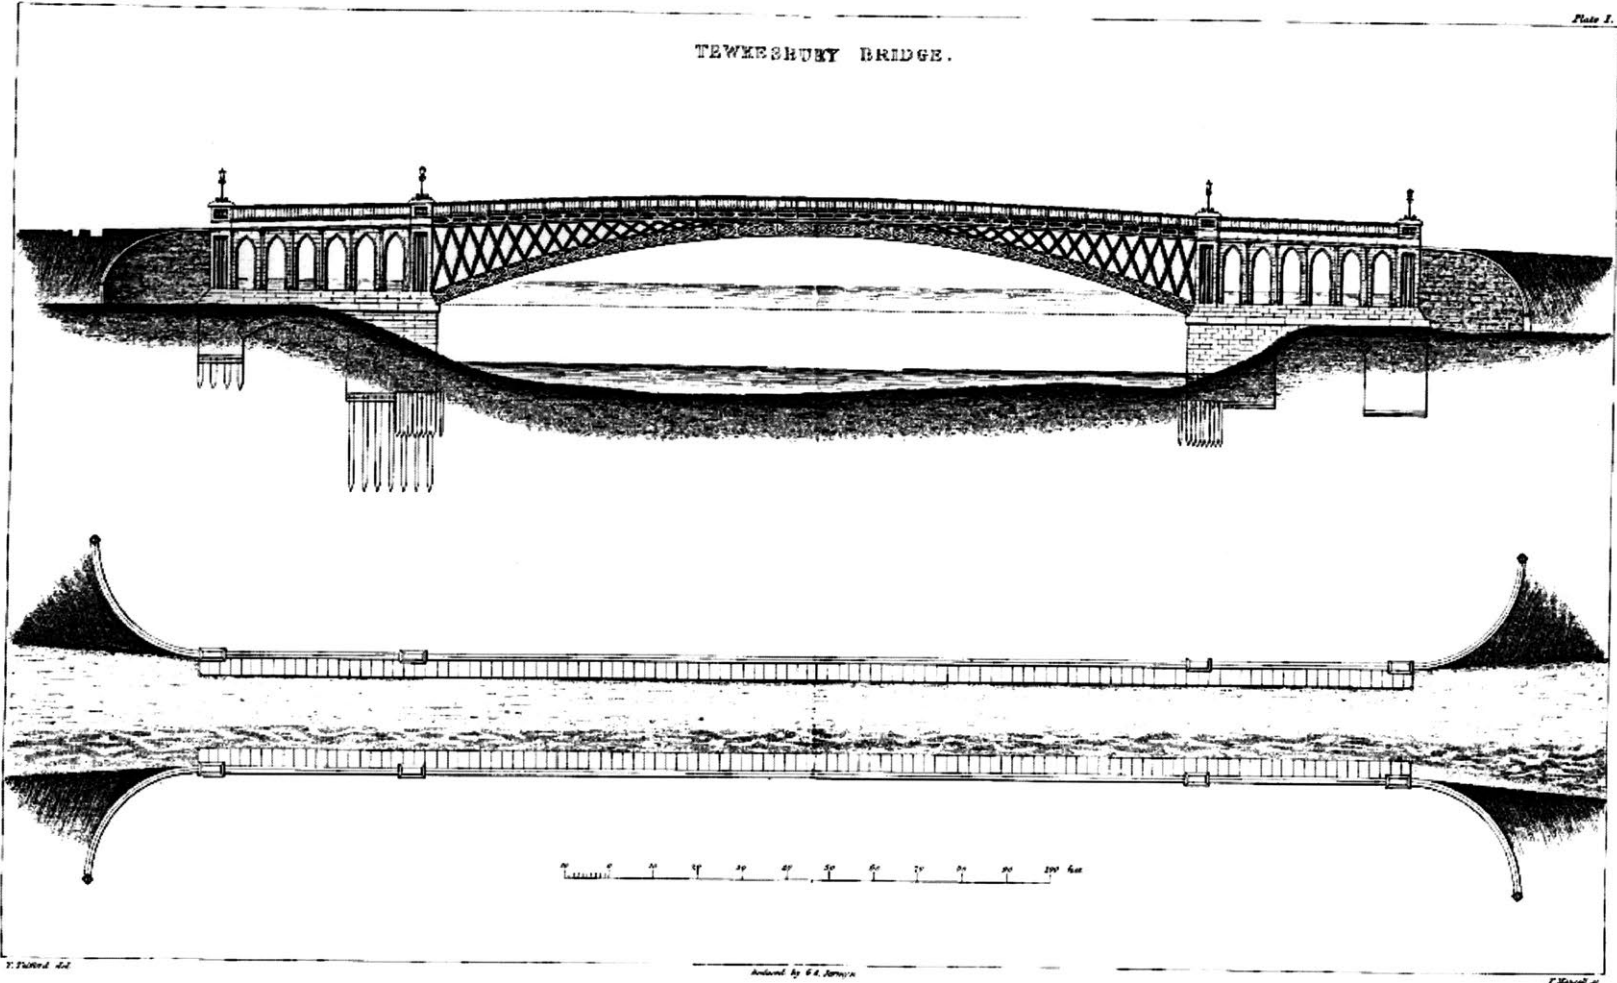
Telford's original drawings of Mythe Bridge – plan and elevation (Mackenzie)
